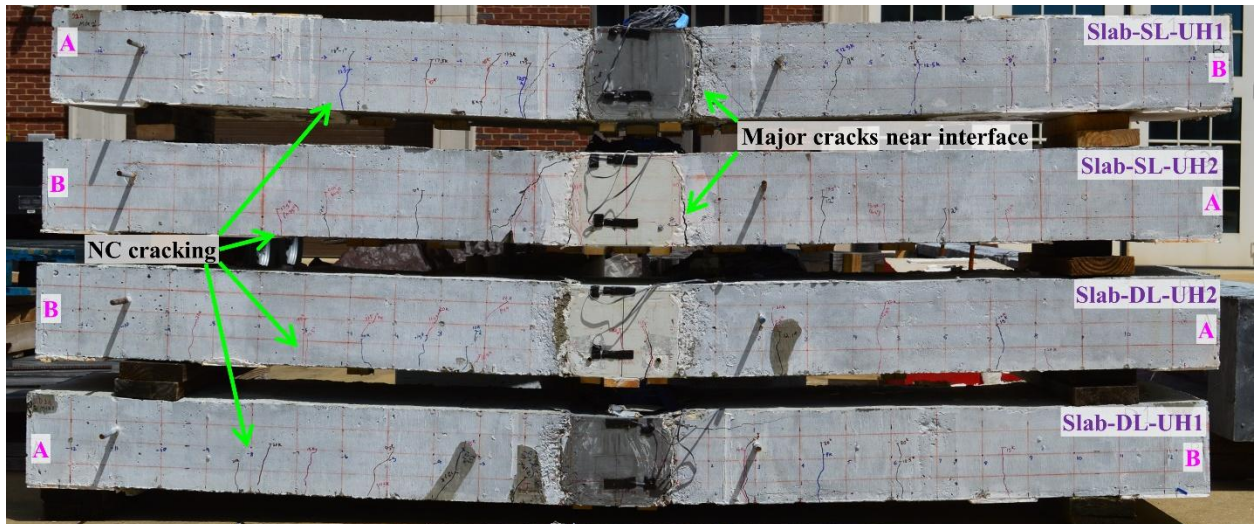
The observed crack patterns in all the slab specimens after Test S4
